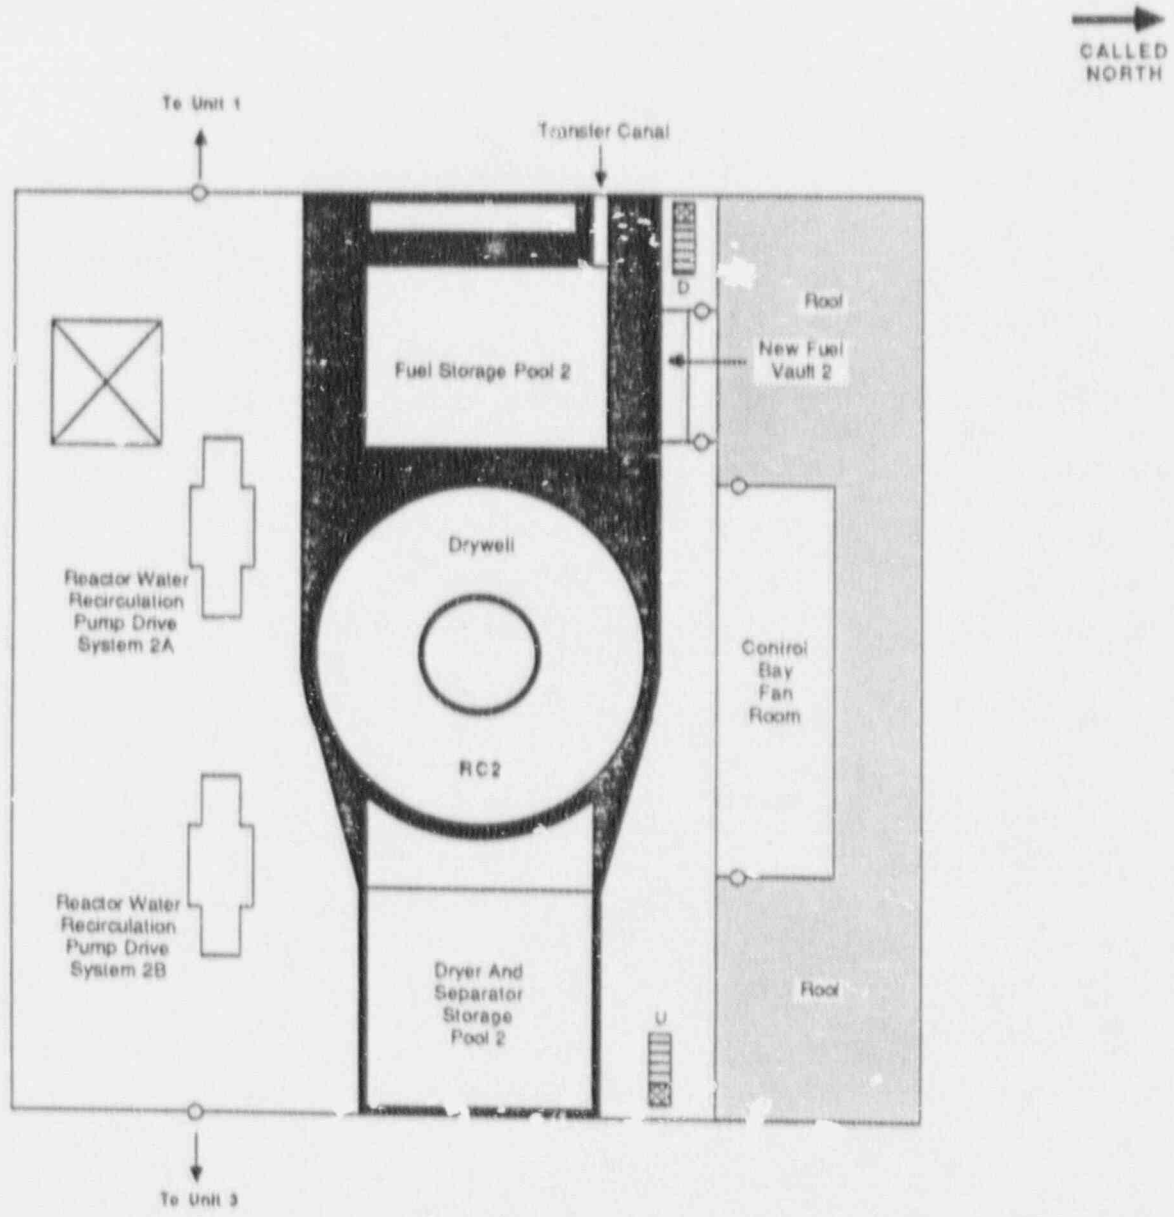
Browns Ferry Unit 2 Reactor Building - 539 ft. Elevation.
